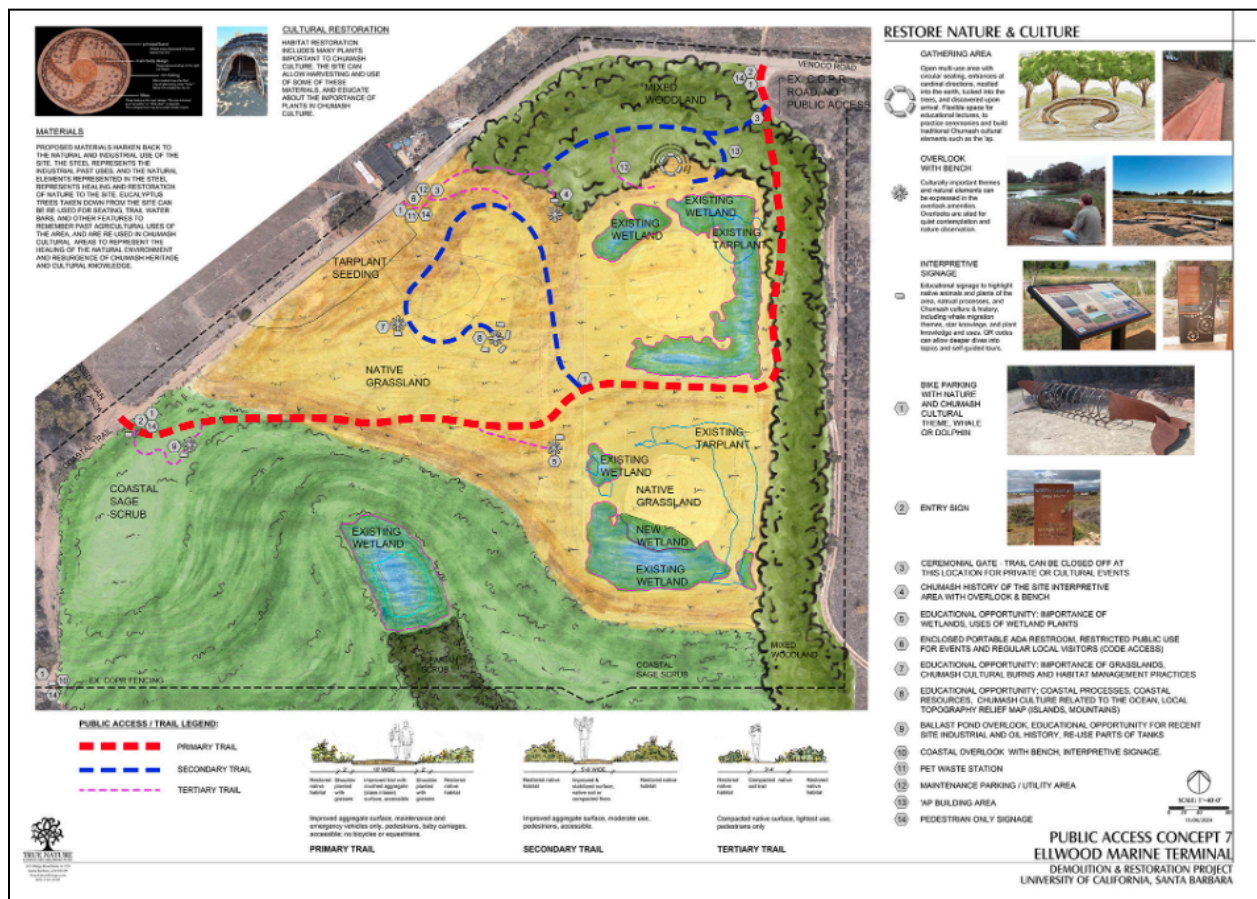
Public access for EMT site plans co-developed with UCSB Design and Construction, Strategic Earth consulting and the Chumash communities.
